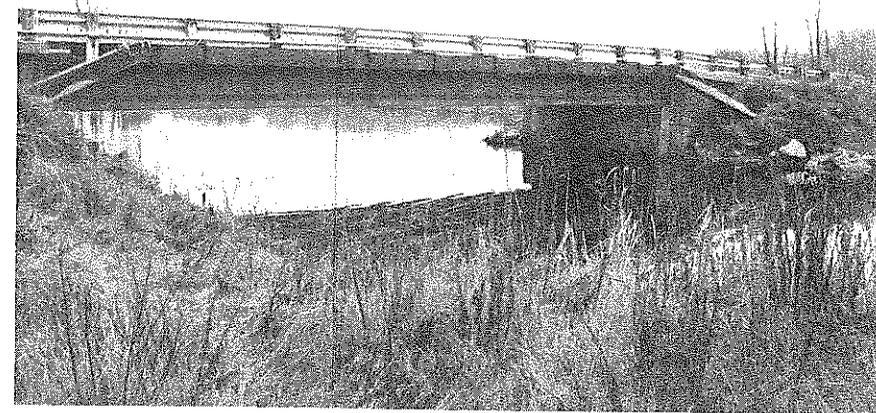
LOOKING DOWNSTREAM TO PETER STREET BRIDGE
